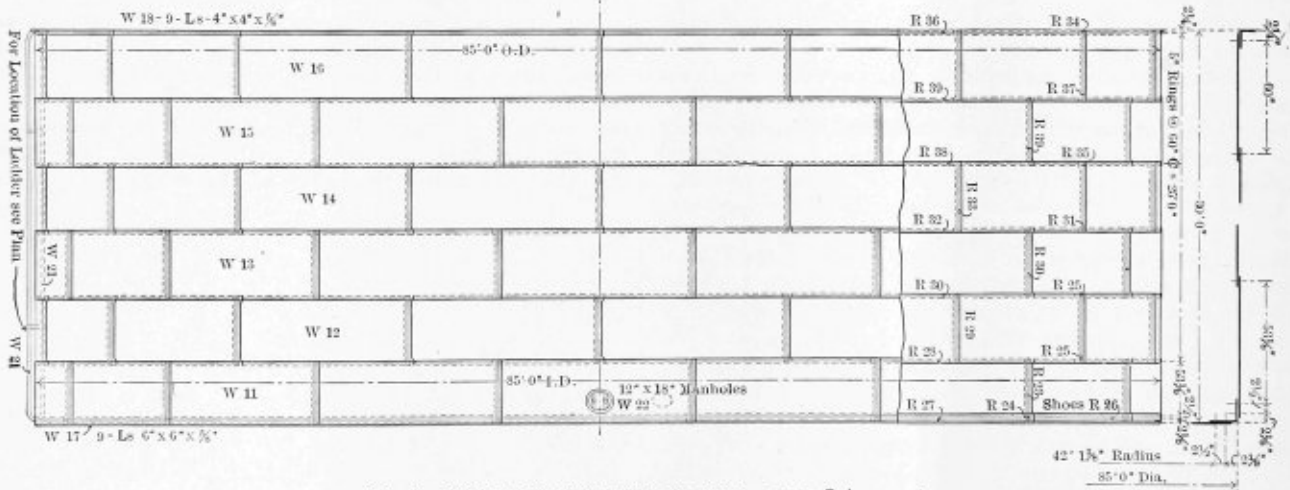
PLAN AND ELEVATION OF STEEL TANK 85' BY 30'.
